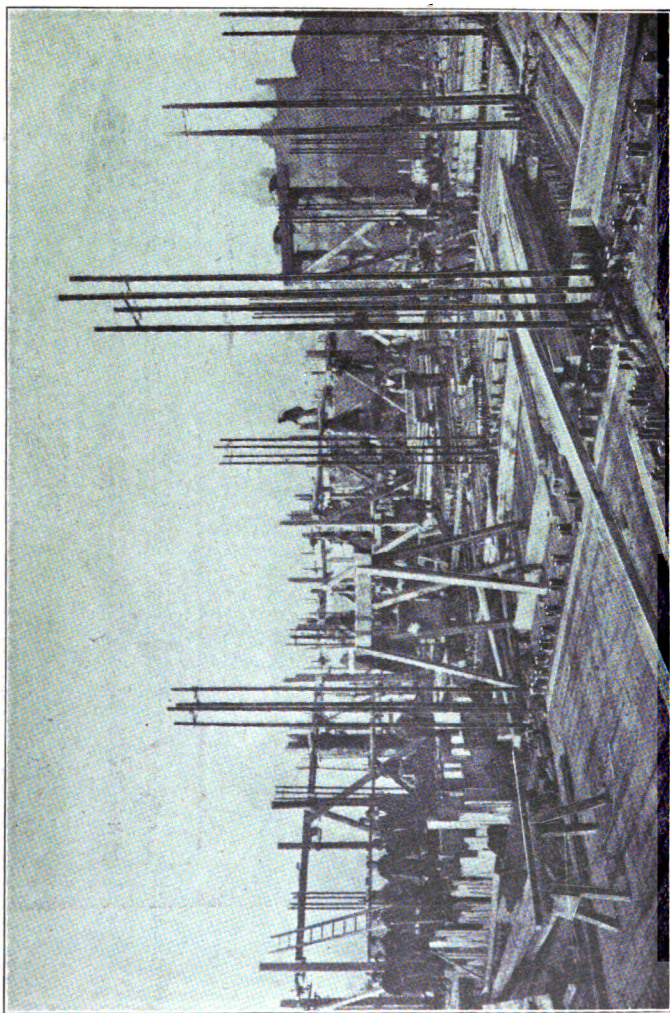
Concreting of Girders, Floors and Columns. Column rods extend through 2 stories.
